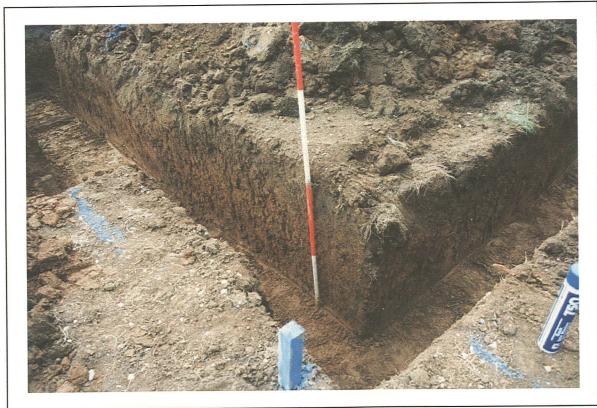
Exposed section, north-eastern corner of Plot 5 - looking south-west
